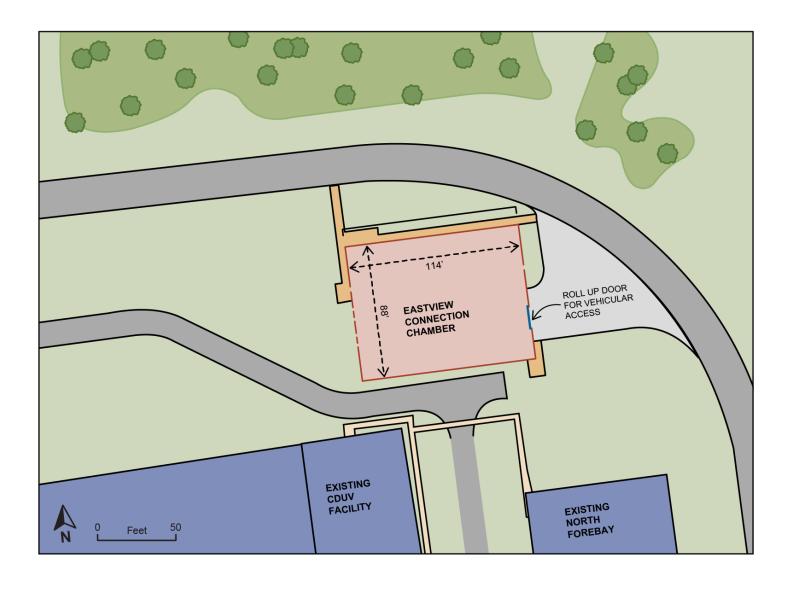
Eastview Connection Chamber – Site Plan and Building Layout
